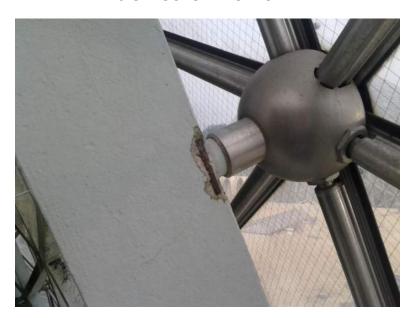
DELAMINATED CONCRETE WAS KNOCKED LOOSE. EXPOSED EDGES OF THE RUSTY STEEL PLATE WERE LATER PAINTED WITH GRAY ZINC-RICH SPRAY PAINT. REMOVING THE CONCRETE PICTURED IN THE PREVIOUS PHOTO ELIMINATES A POTENTIAL FALLING HAZARD.
